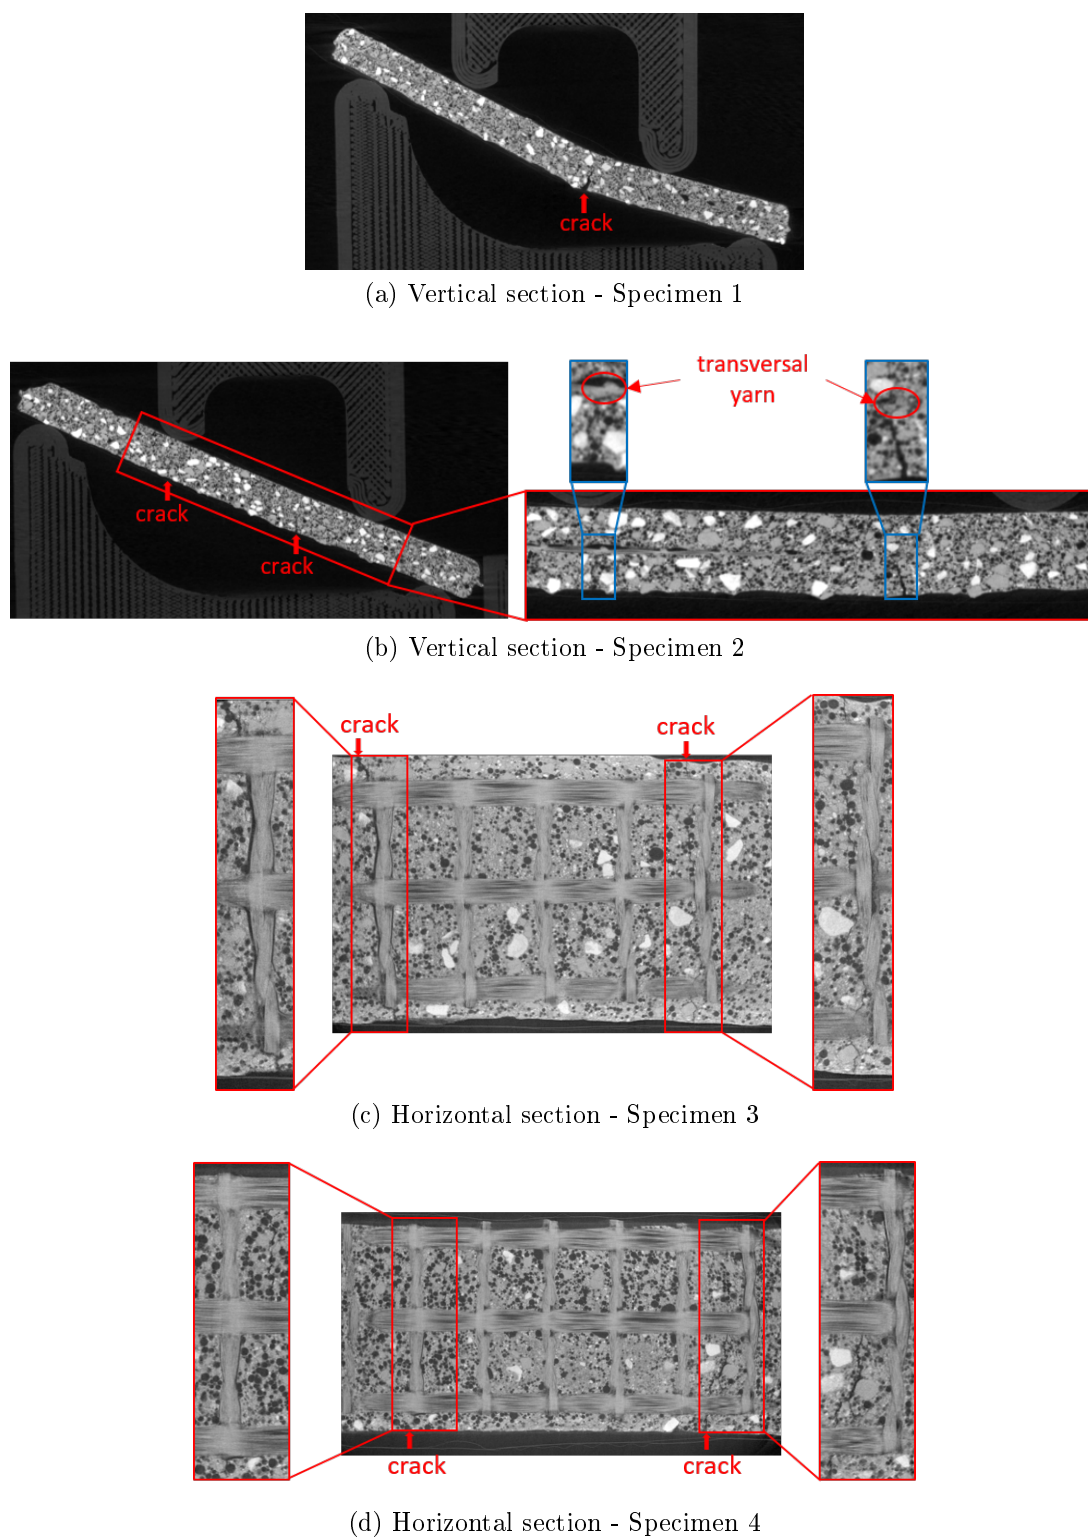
Sections inside the reconstructed volume of the cracked M1-We-2 samples: (a) Vertical section - Specimen 1, (b) Vertical section - Specimen 2, (c) Horizontal section - Specimen 3, and (d) Horizontal section - Specimen 4.
